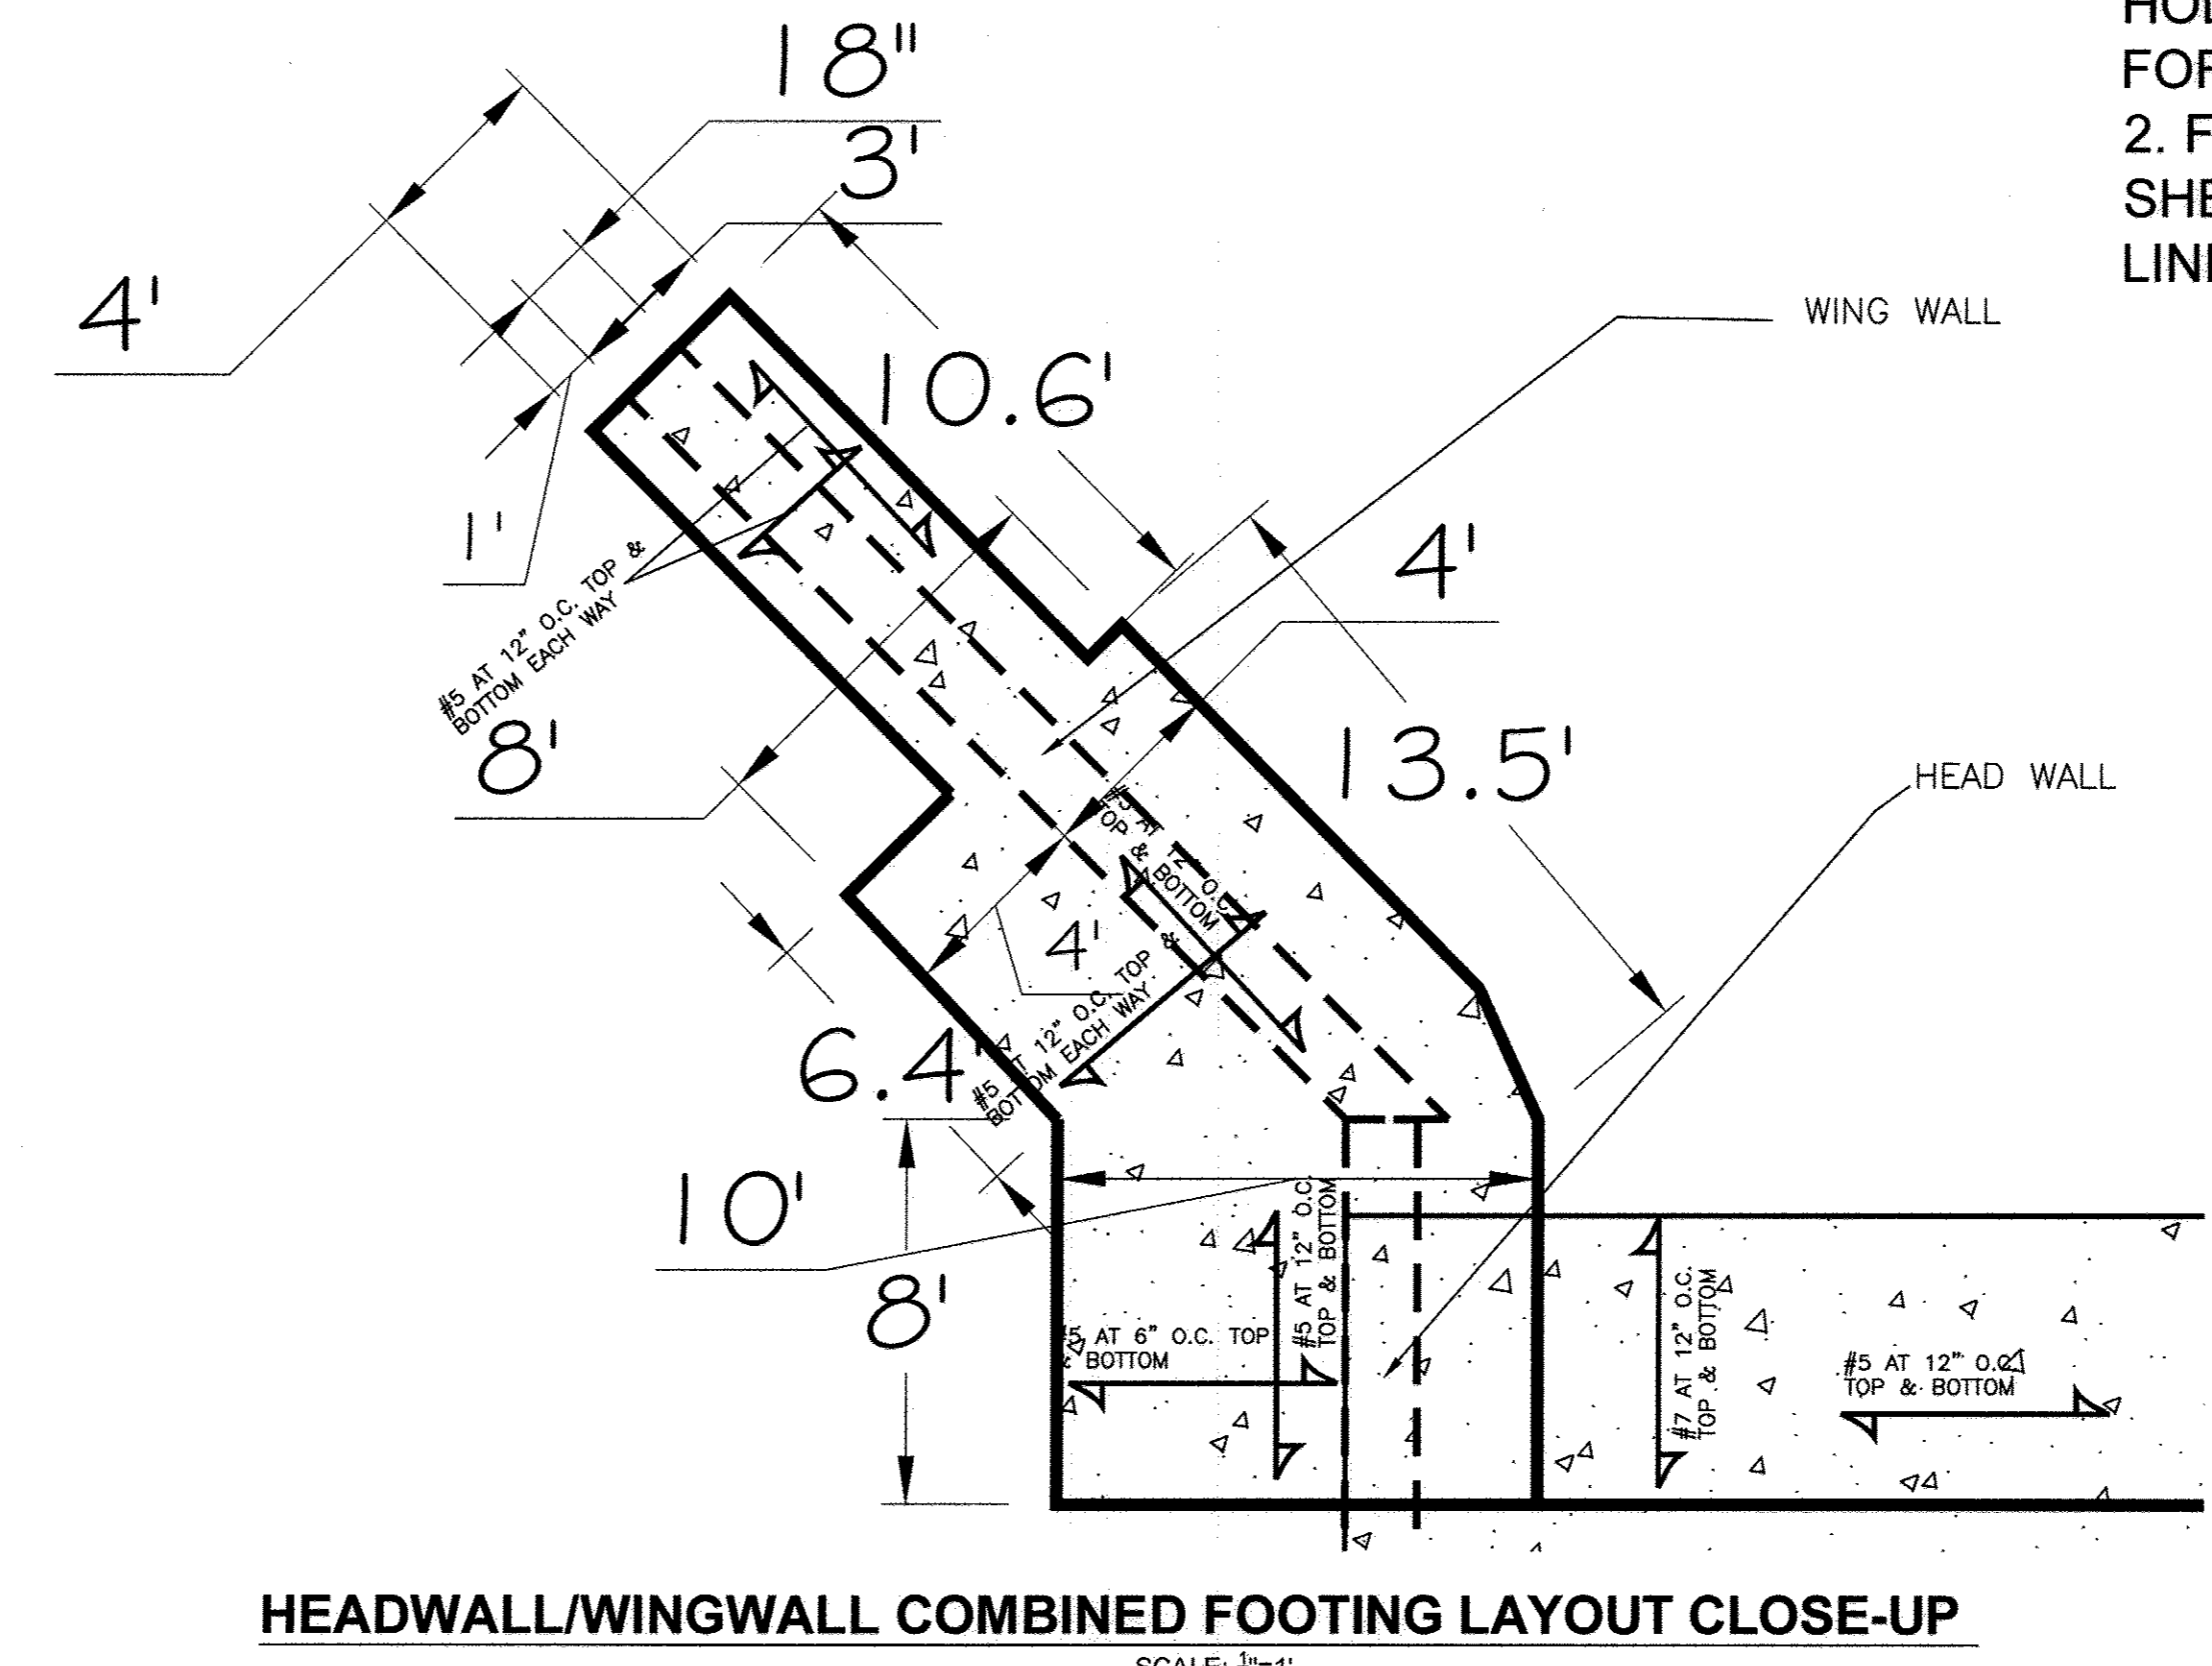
PLATE ARCH AND HEADWALL/WINGWALL COMBINED FOOTING LAYOUT
